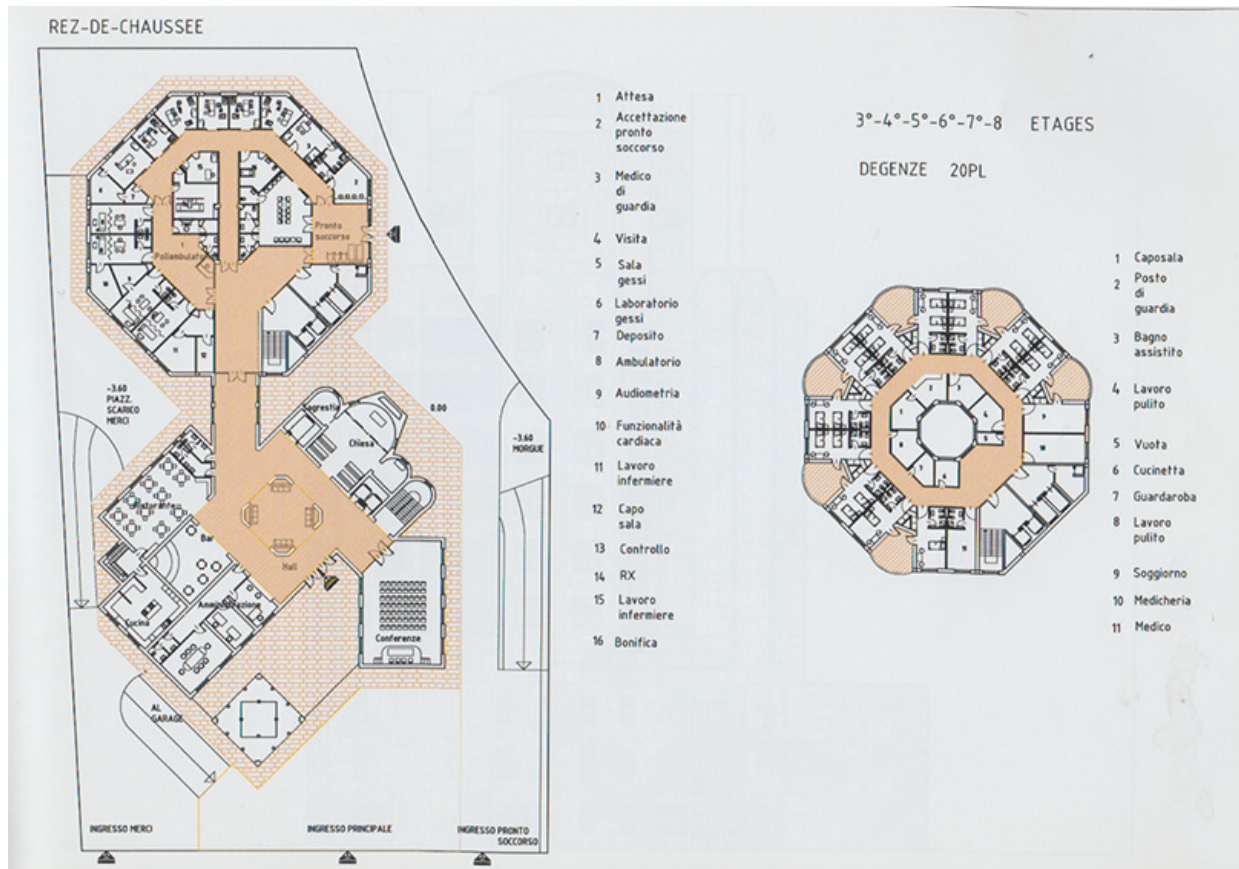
Floor plan of the New Hospital tower building (Source: Authors' archive, 2000).
